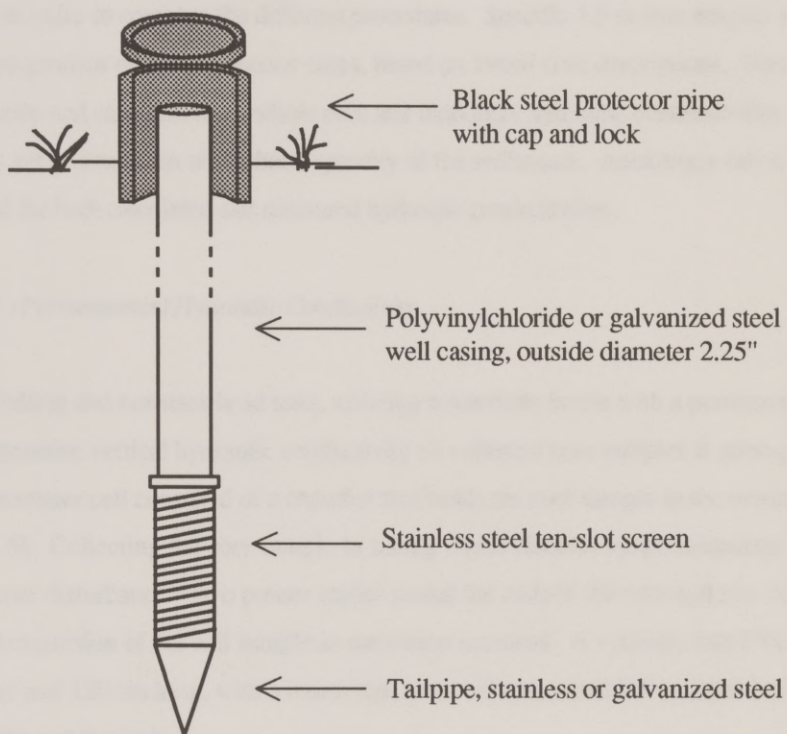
Typical well construction at the Bemidji, MN research site, not to scale.
